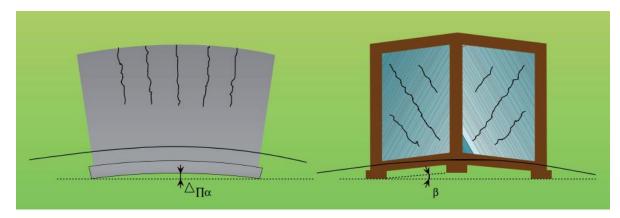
Probable behavior of different kind of bearing structures undergoing a "hogging mode" type of induced deformations in masonry and framed buildings. (Vittorio Guglielmetti P. G., 2008)
